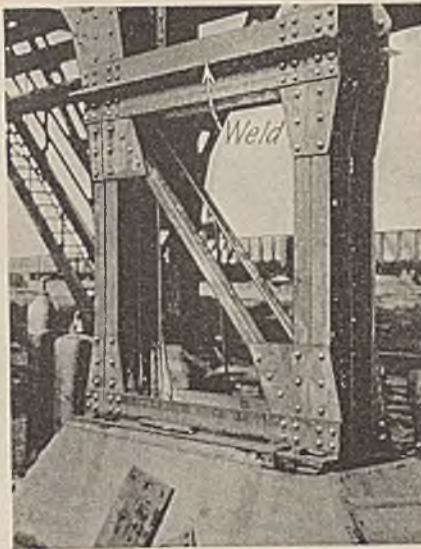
Substructure Was Welded to Original Legs to Elevate Bins
